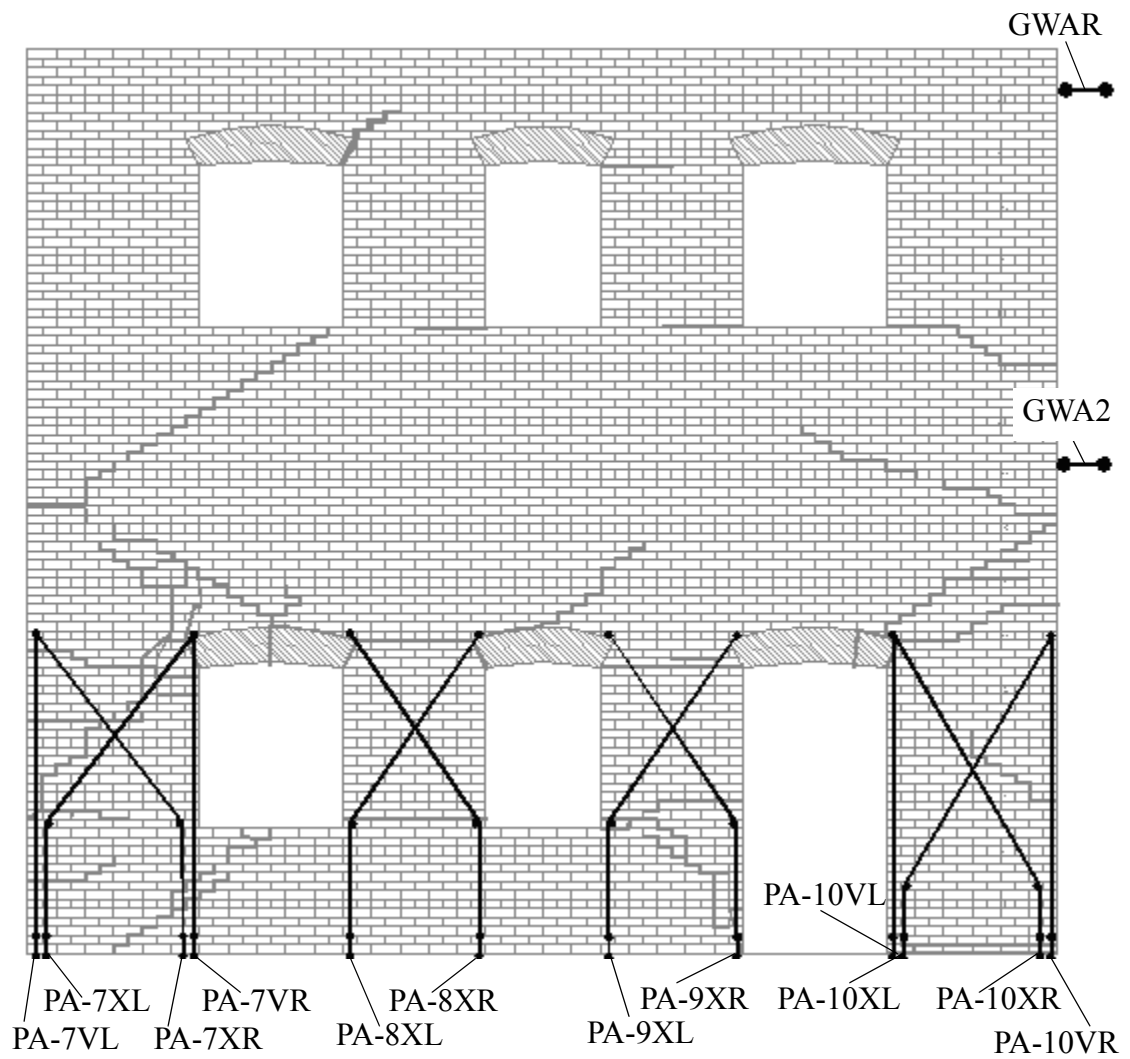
Elevation view of Wall A illustrating the location of LVDTs.
